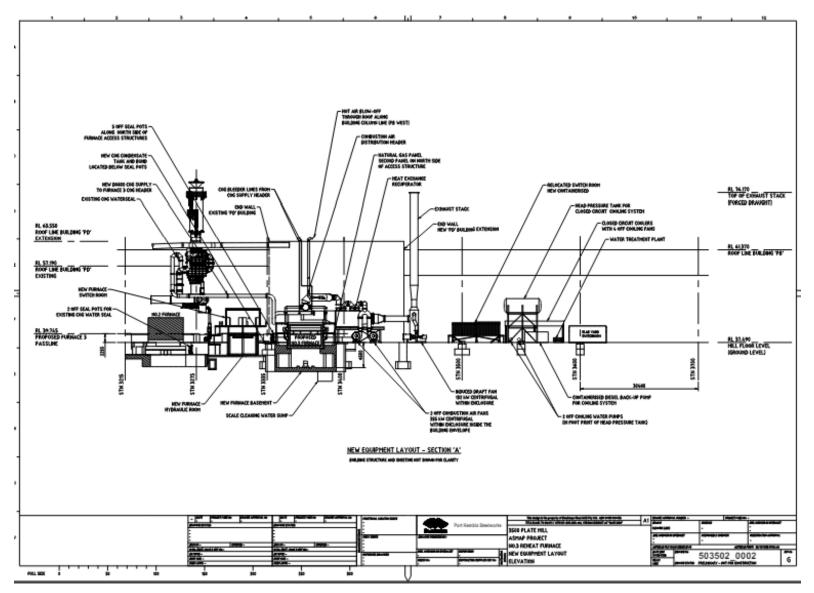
New Walking Beam Furnace – Elevation (Drawing #: 503502_0002, Rev G)
